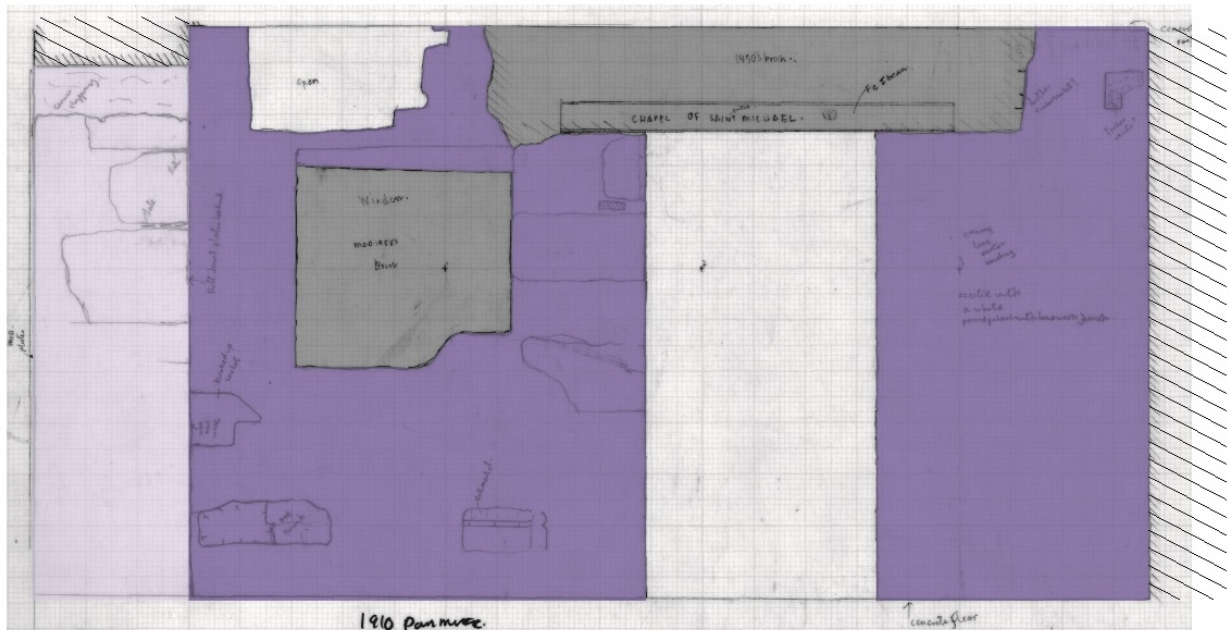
Eastern elevation of remnant stair tower with original masonry to left, possible secondary interventions in purple and 20<sup>th</sup> century alterations in grey
